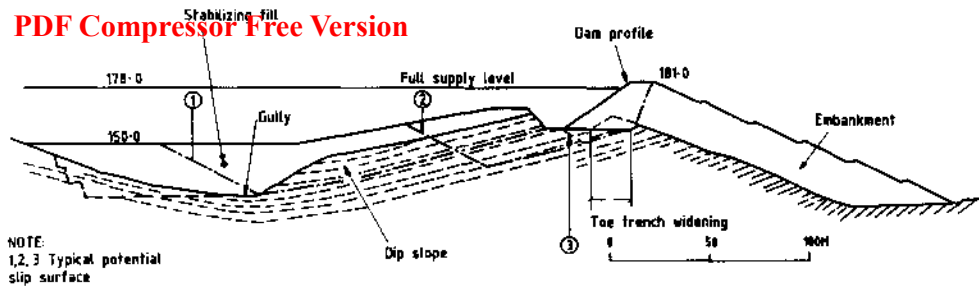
Sugarloaf Dam, cross section through left abutment ridge section.
